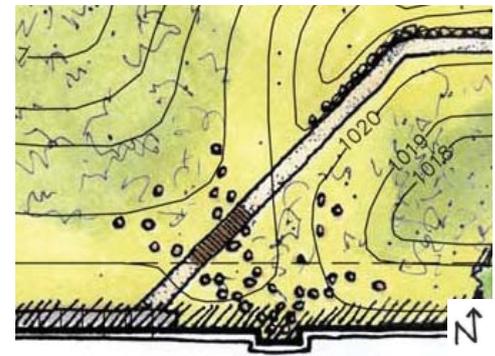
Enlarged Plan of North Roof Drain Area. Not to Scale. Plan by Author
